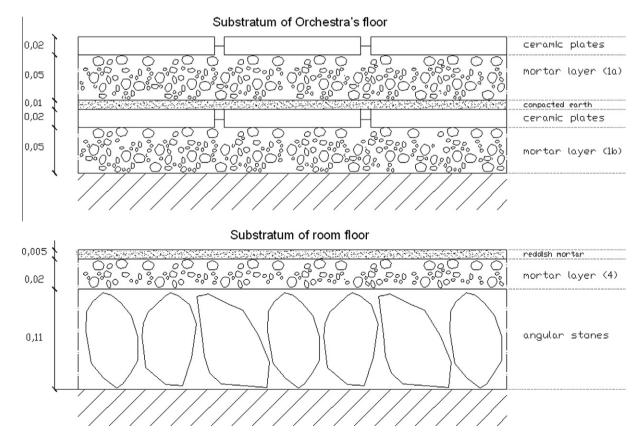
Statigraphy of Orchestra's (samples 1a, 1b) and room's 6 floor substratum (sample 4).
